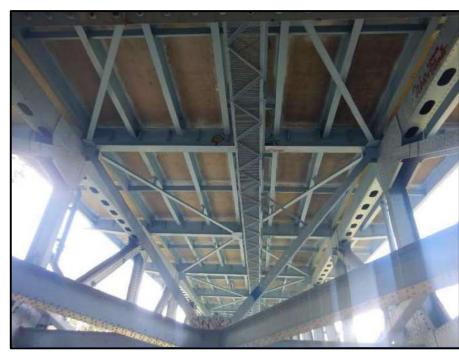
Looking north at general underside of span 1. Note: cracking with light efflorescence in deck.
